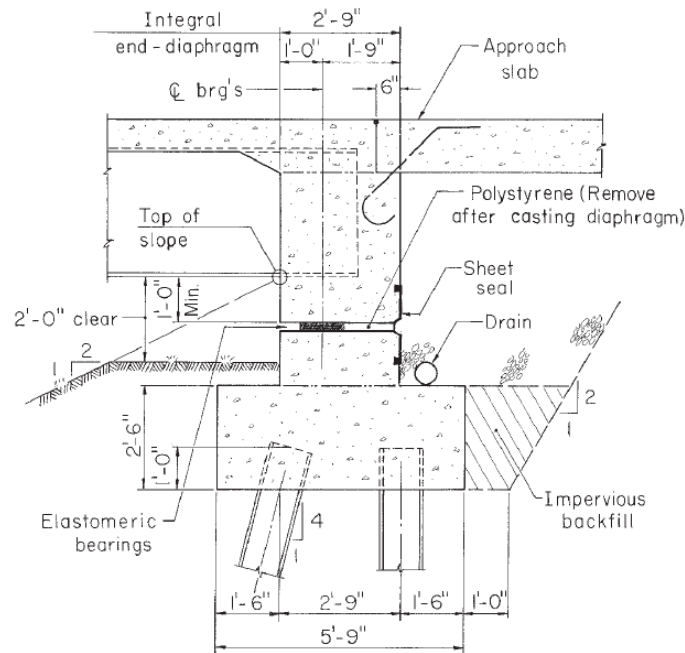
SIAB abutment and foundation detail (Burke, 2009)
